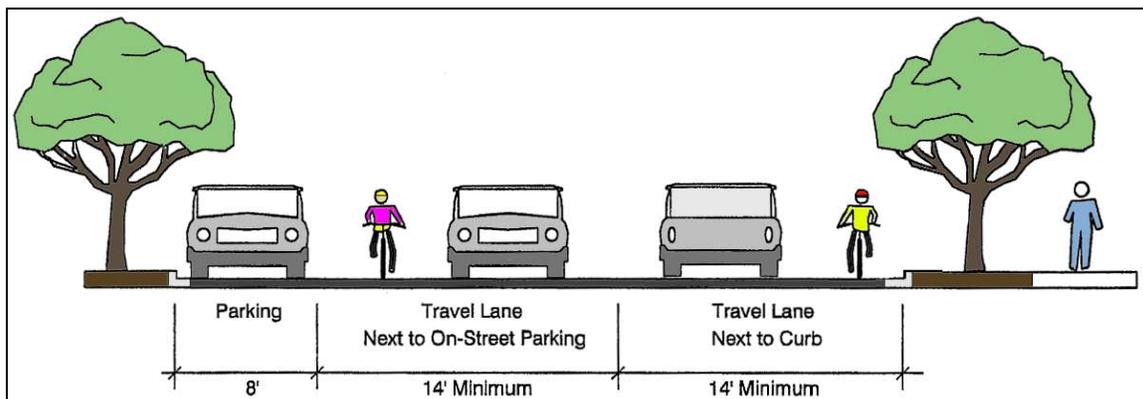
Typical Bicycle Lane Section – With and Without Parking
